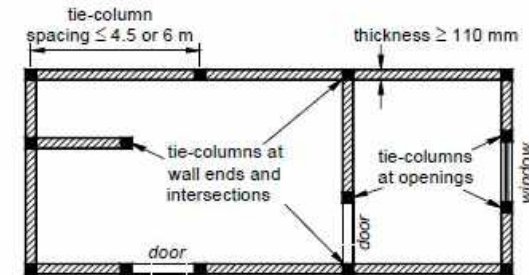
Typical floor plan illustrating the placement of RC tie-columns (Brzev, 2008).
